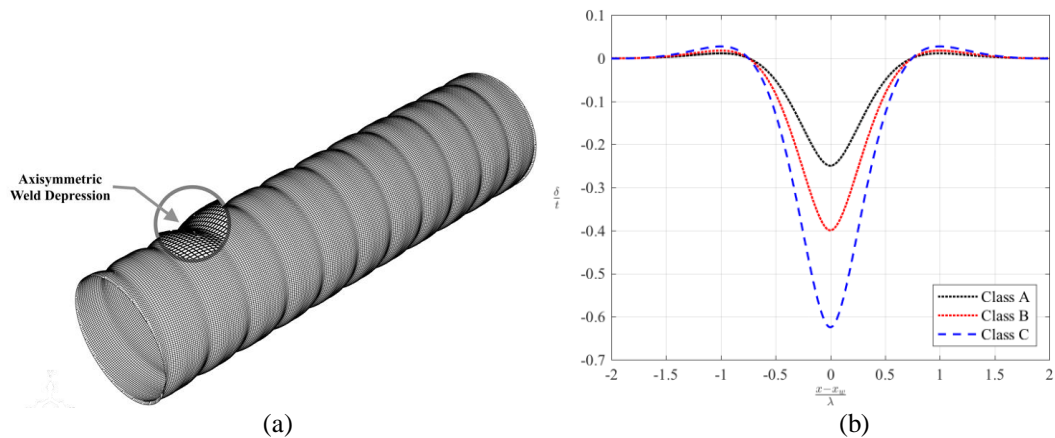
(a) Typical spirally welded tube with scaled weld depression imperfection along spiral seam weld, and (b) weld depression profiles as recommended by EC3-1-6 using Type A weld profile proposed by Rotter and Teng (1989).
